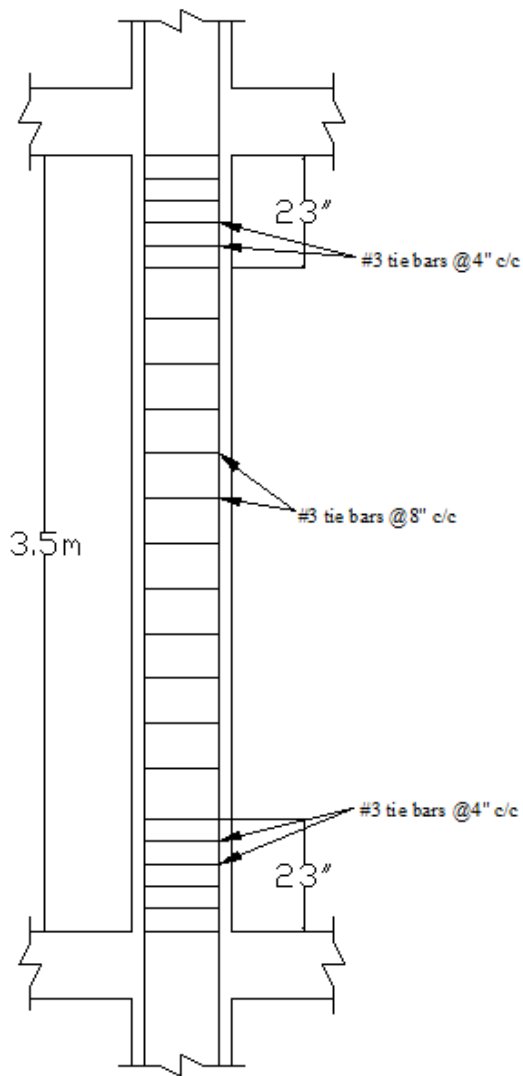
Column rod detailing of CC and CEX for top 4 floors and CI for all floors
